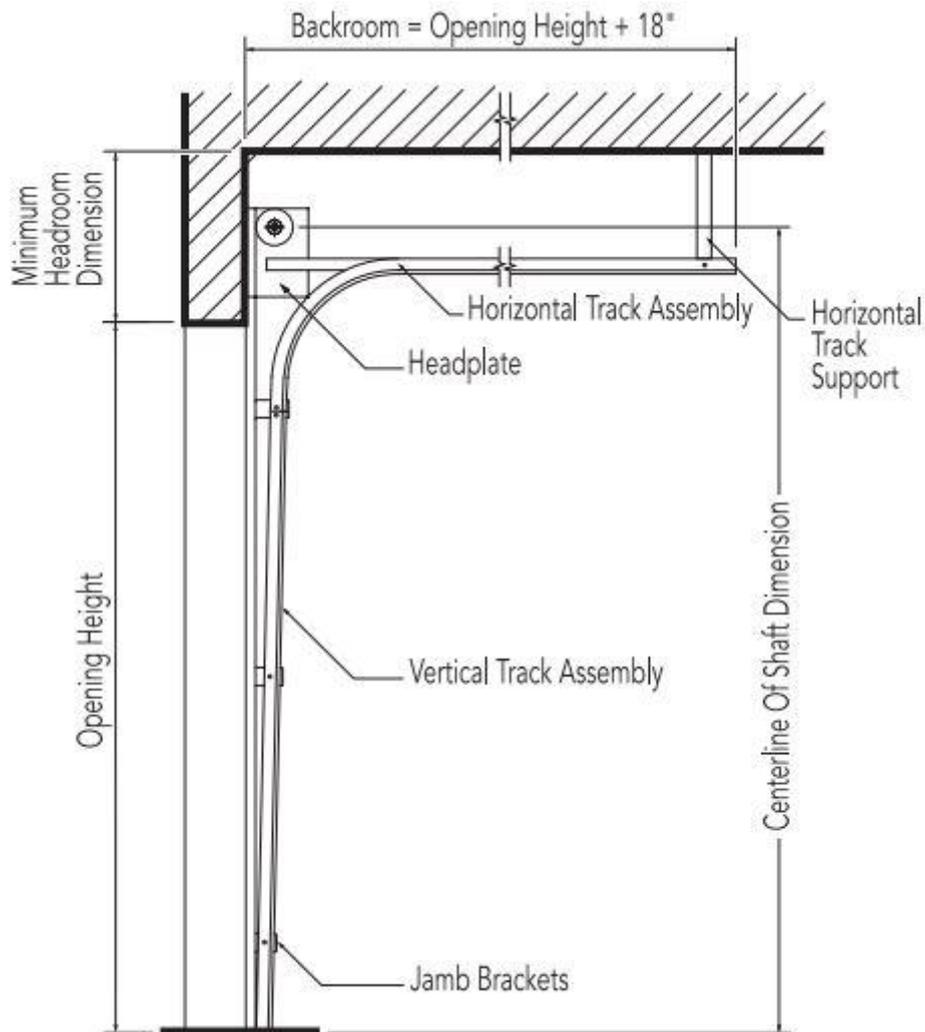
It shows the dimensional requirements of Sectional Door [2].
